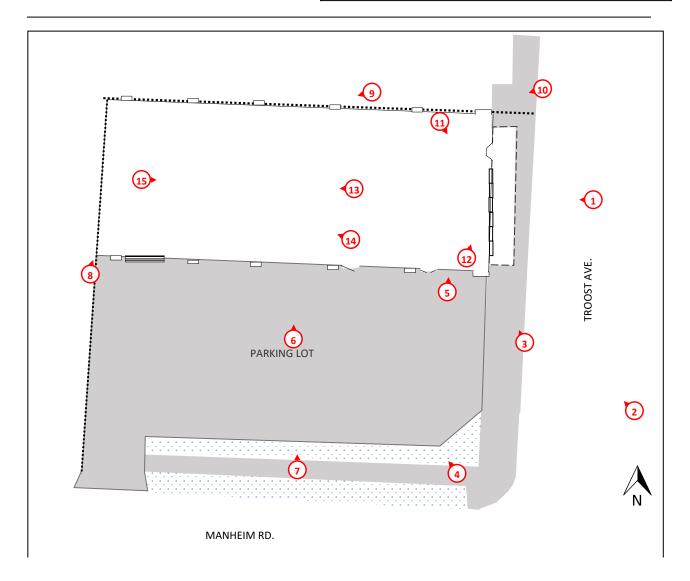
Safeway No. 357 current floorplan and key to photographs (drawing not to scale).
